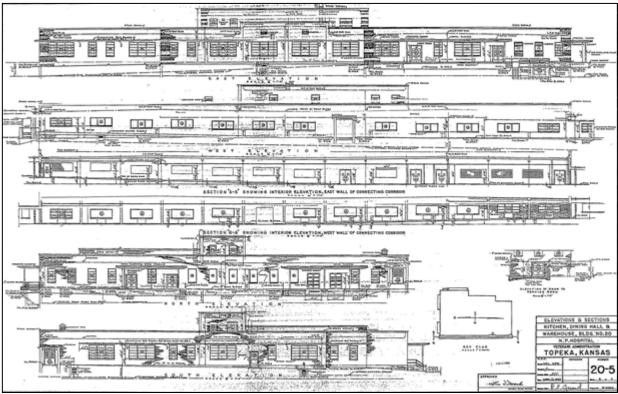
Architectural drawings for Building No. 20 showing the elevations and a sectional detail of the interior wall elevation of the connecting corridor, 1955 (VA). Note the key plan in the bottom right that provides the building footprint, essentially rectangular with a stepped east elevation that makes the north elevation deeper than the south.
